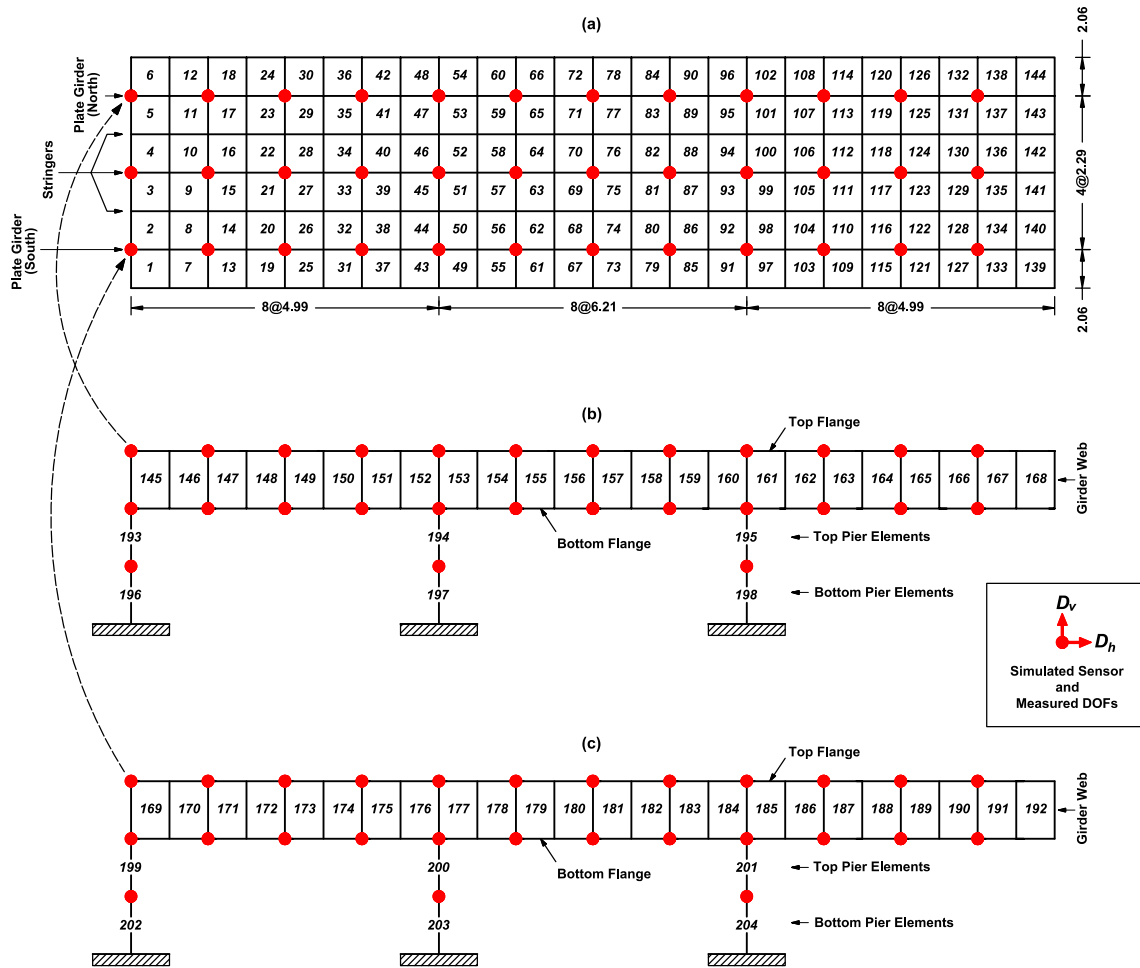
The numerical model and element numbers of the I-40 bridge: a the concrete deck, b the north girder and piers, and c the south girder and piers (D_h horizontal DOF, D_v vertical DOF)
